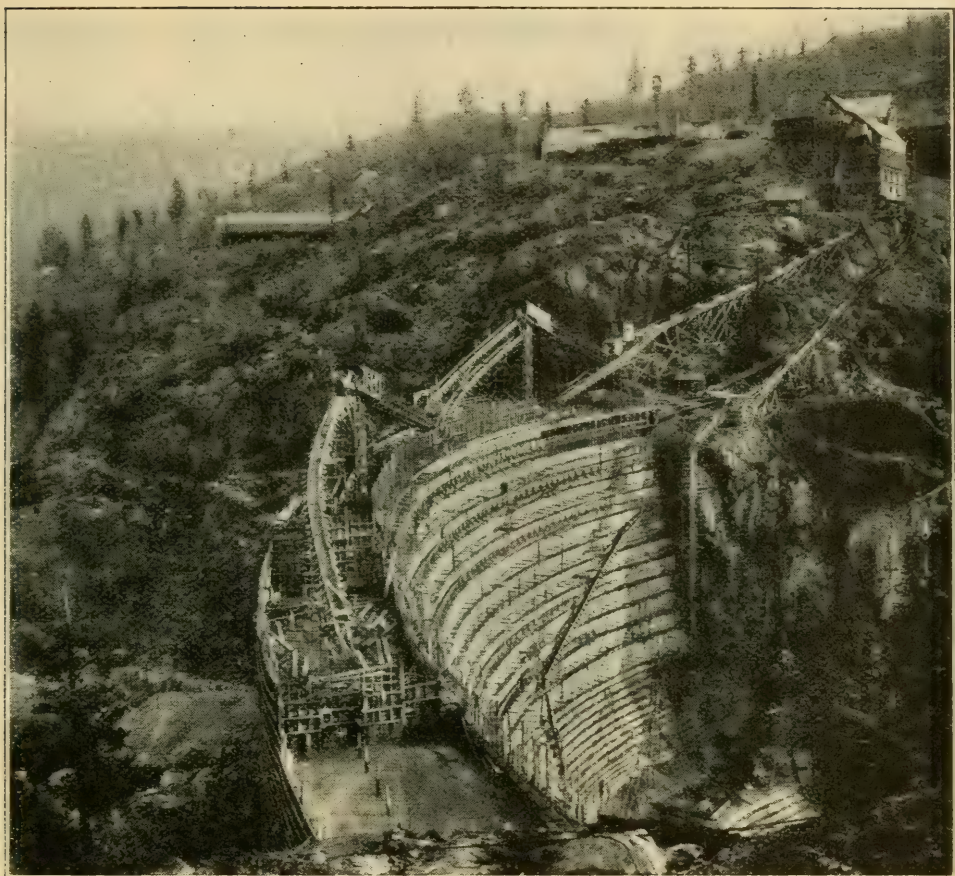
LAKE SPAULDING DAM. MIXING HOUSE, DISTRIBUTING FLUMES, AND BELT CONVEYORS. THE METHOD OF CONSTRUCTING THE EXPANSION JOINTS CAN BE SEEN.
